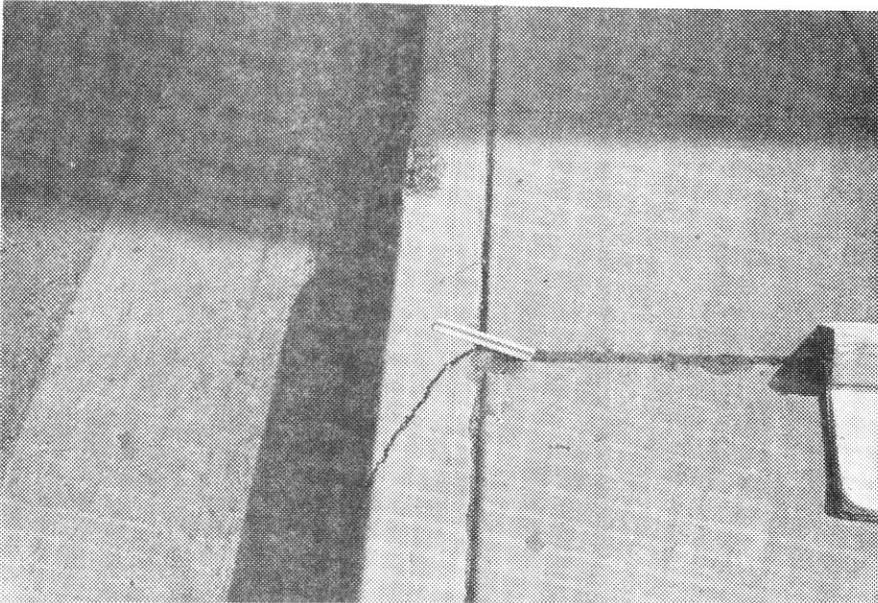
Typical curb crack and displacement caused by forces from curtain wall movement.
